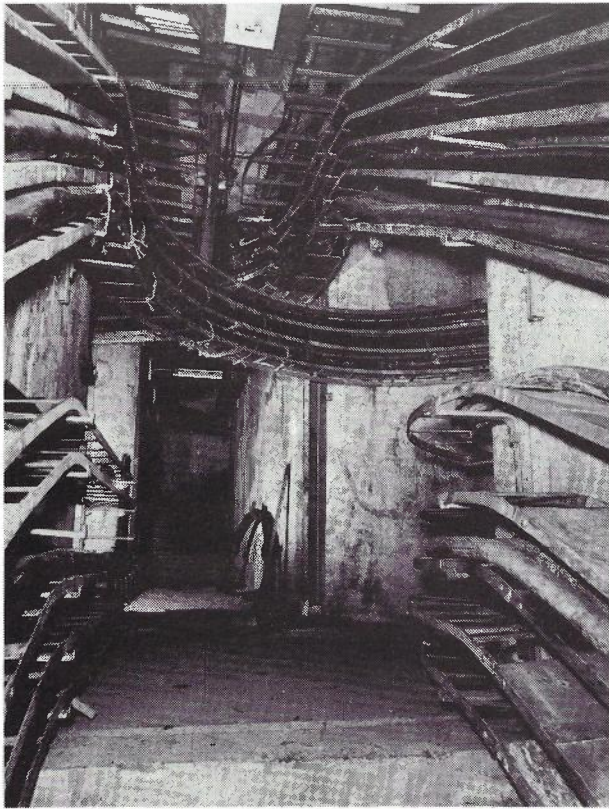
Intersection, Pitt St. Tunnel and Haymarket Exchanges Break-off (General View from Tunnel Leading to Haymarket Exchange).
